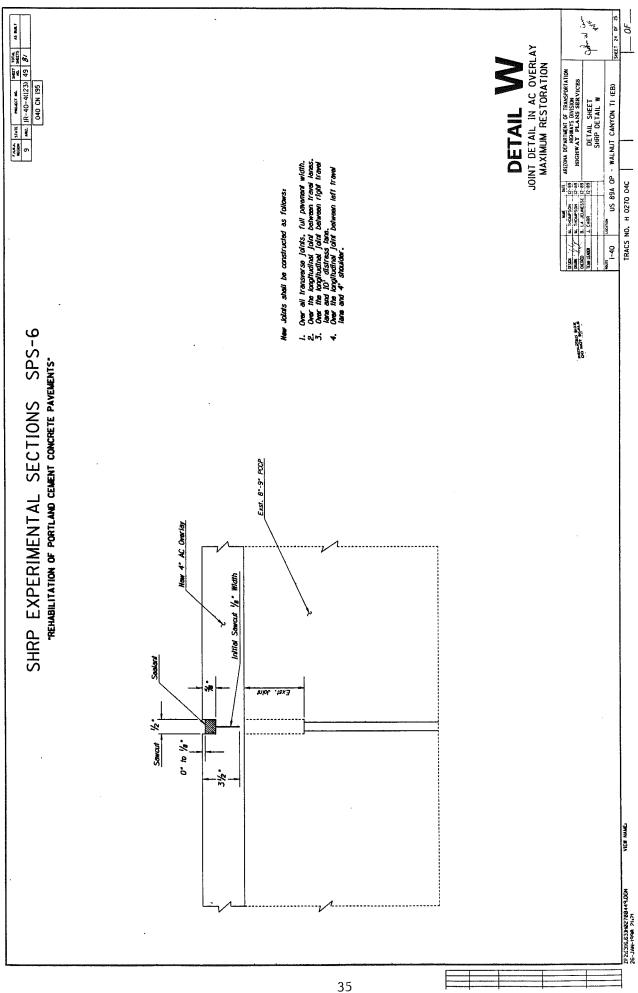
PAVEMENT RESTORATION DETAILS (continued)
